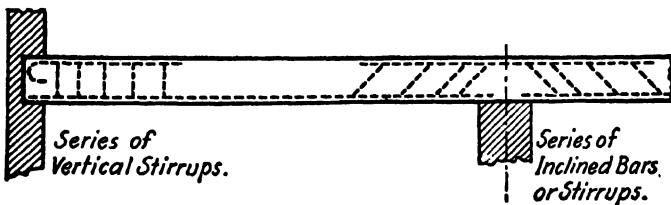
Typical reinforced concrete beam; web reinforced by means of series of vertical stirrups or series of inclined bars or stirrups.
